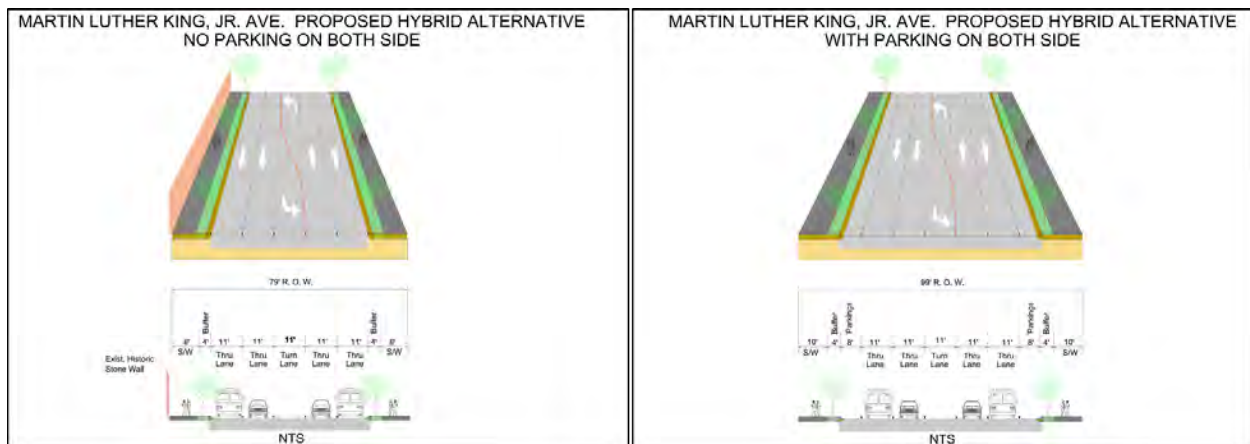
Proposed Typical Cross Sections on Martin Luther King Jr. Avenue SE in 2012 EIS
